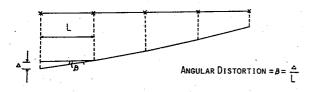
DEFINITION OF ANGULAR DISTORTION FOR FRAMED STRUCTURES
